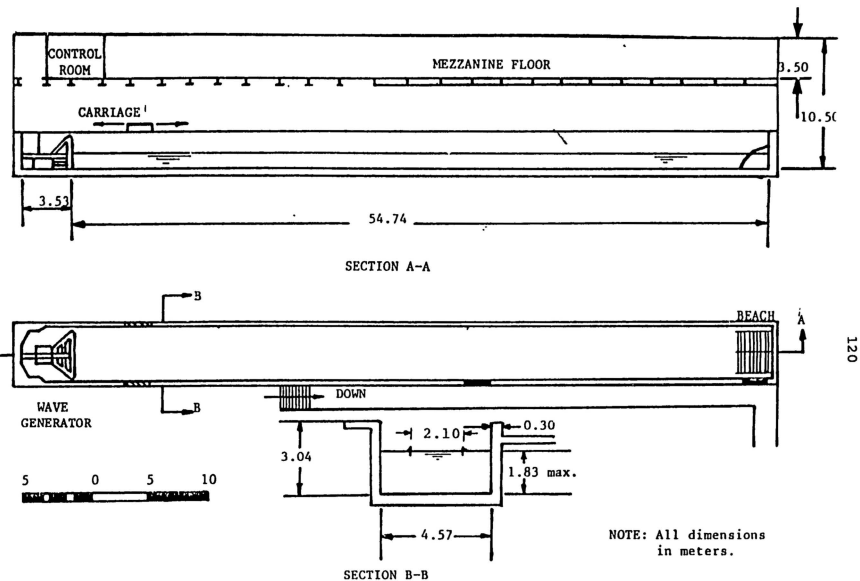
Elevation and Plan View of Wave/Towing Tank
